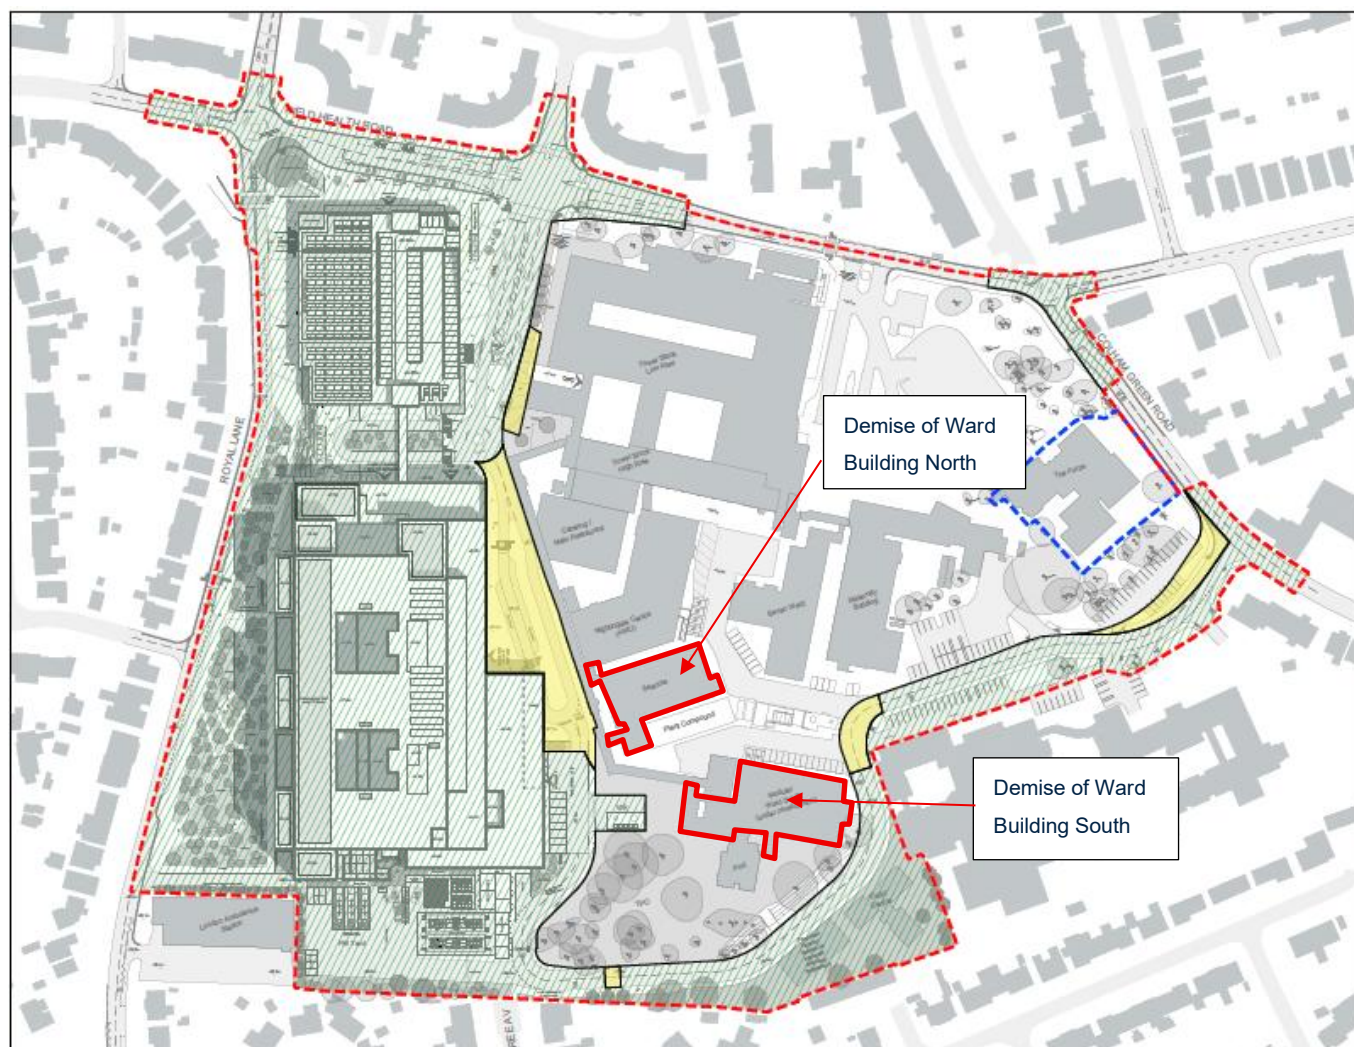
Approved planning drawing, titled: 'PHASE 1A AND 1B OF DETAILED APPLICATION'. (For ease to the reader Savills have outlined and labelled the demise of Building North and Ward Building South)
